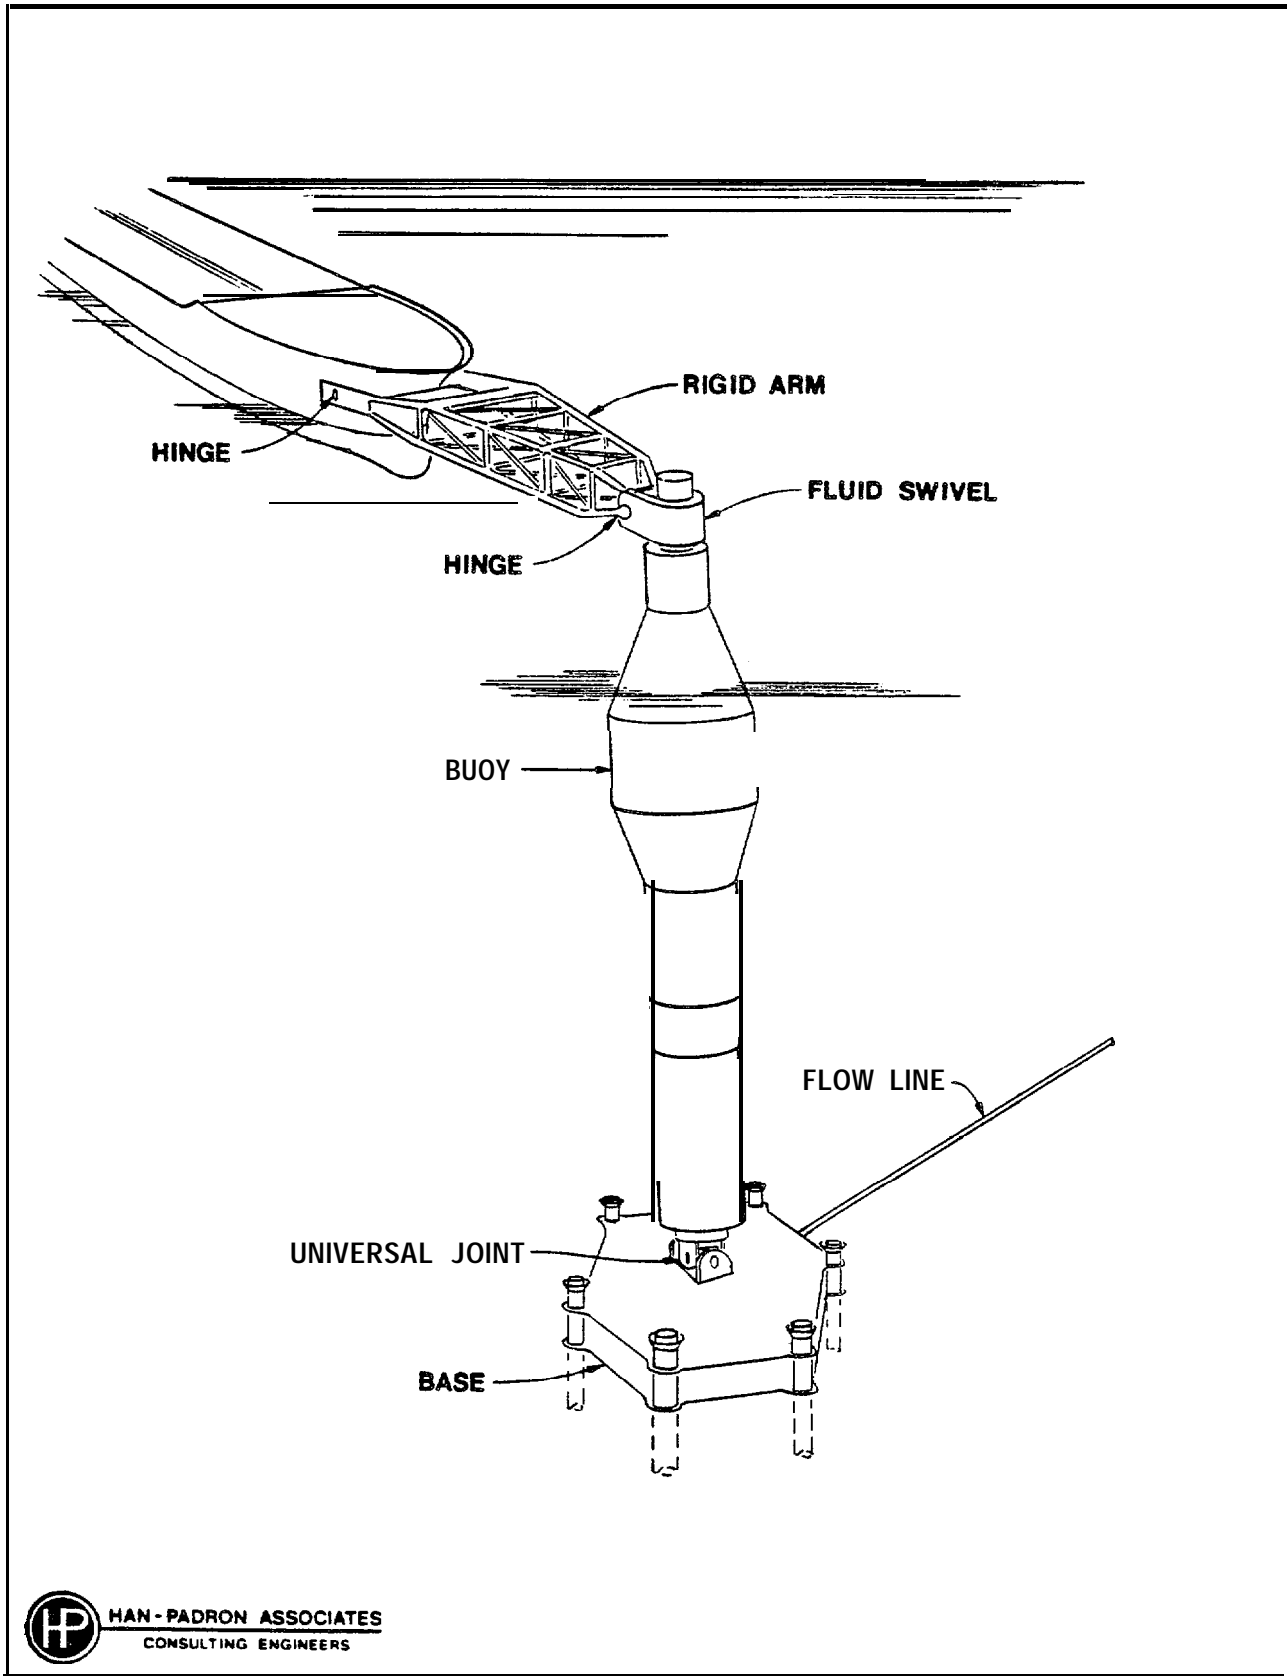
Fulmar Field single anchor leg mooring (SALM) with floating storage unit (FSU).
